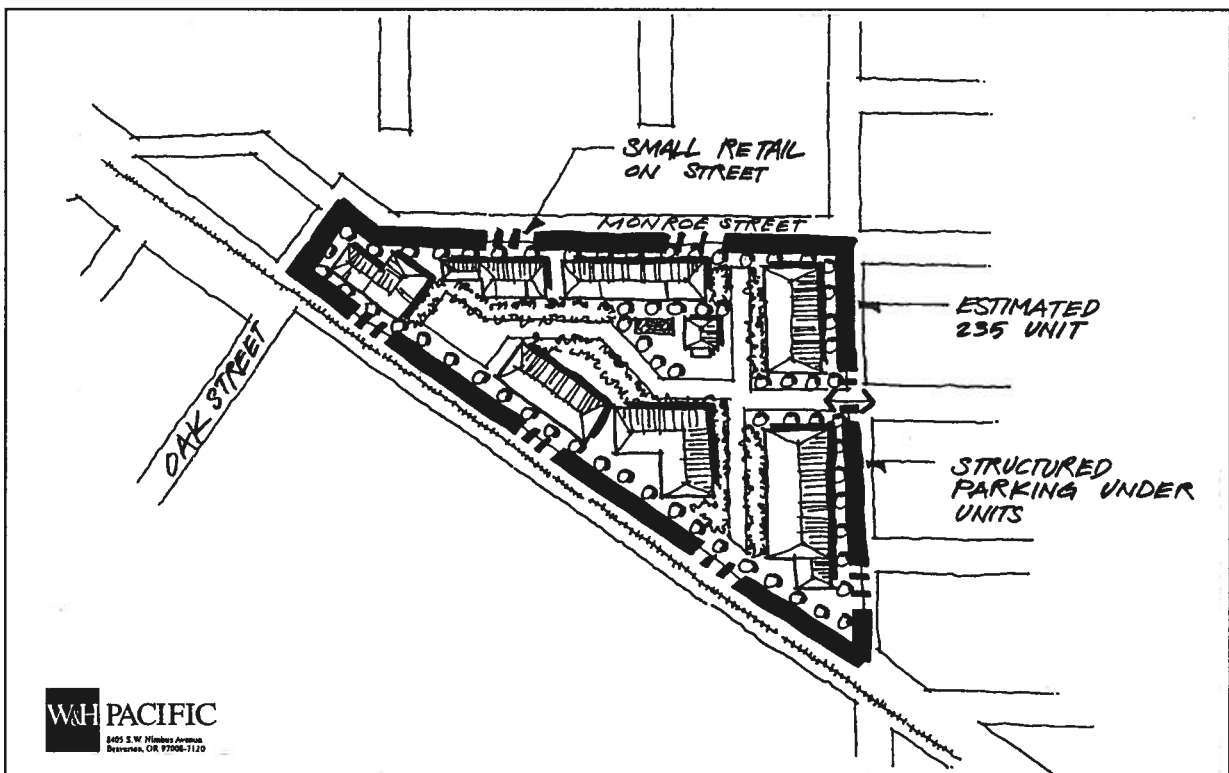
Schematic Master Plan of Subarea 4 Redevelopment Site
